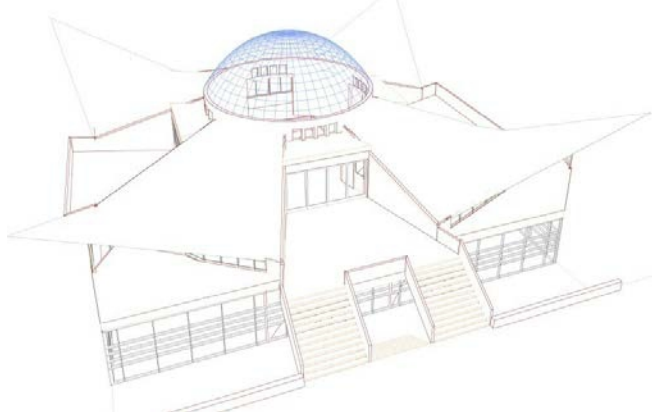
Exterior perspective of the building with the central dome and the concrete shells.
